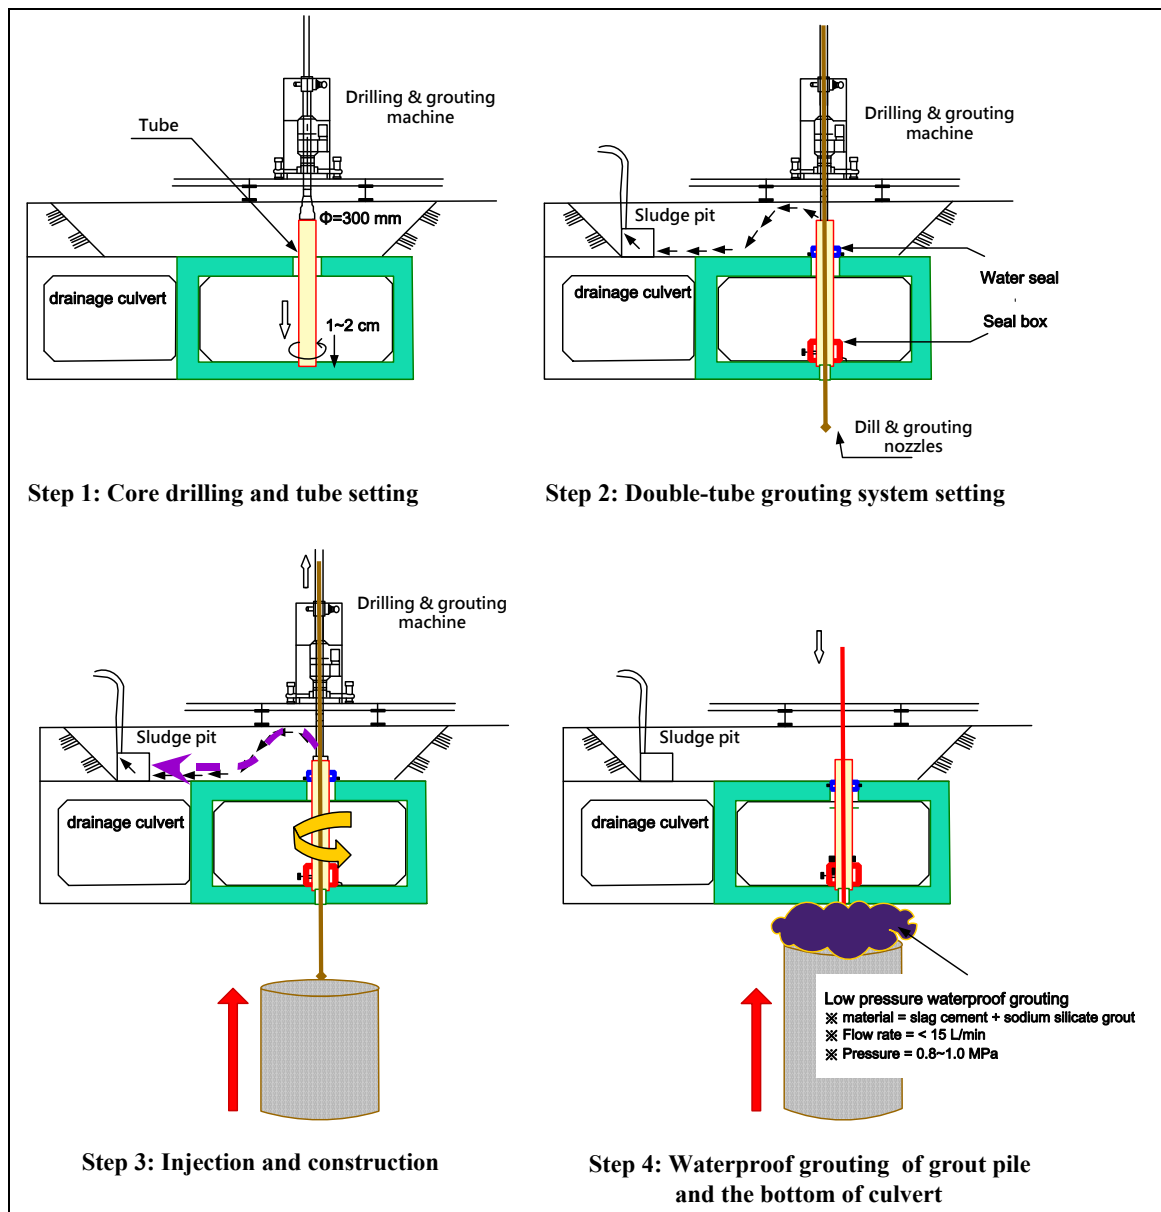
The procedures of jet grouting under drainage culvert and treatment for culvert
